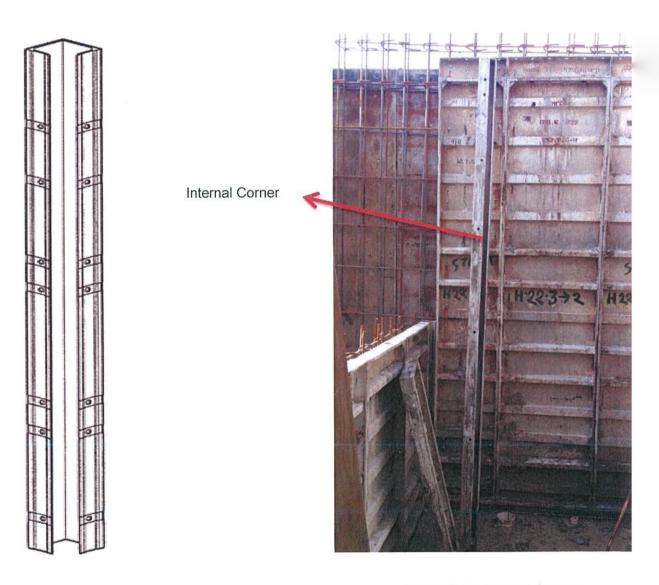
Internal Corner Source: architectjaved.com (n.d)
